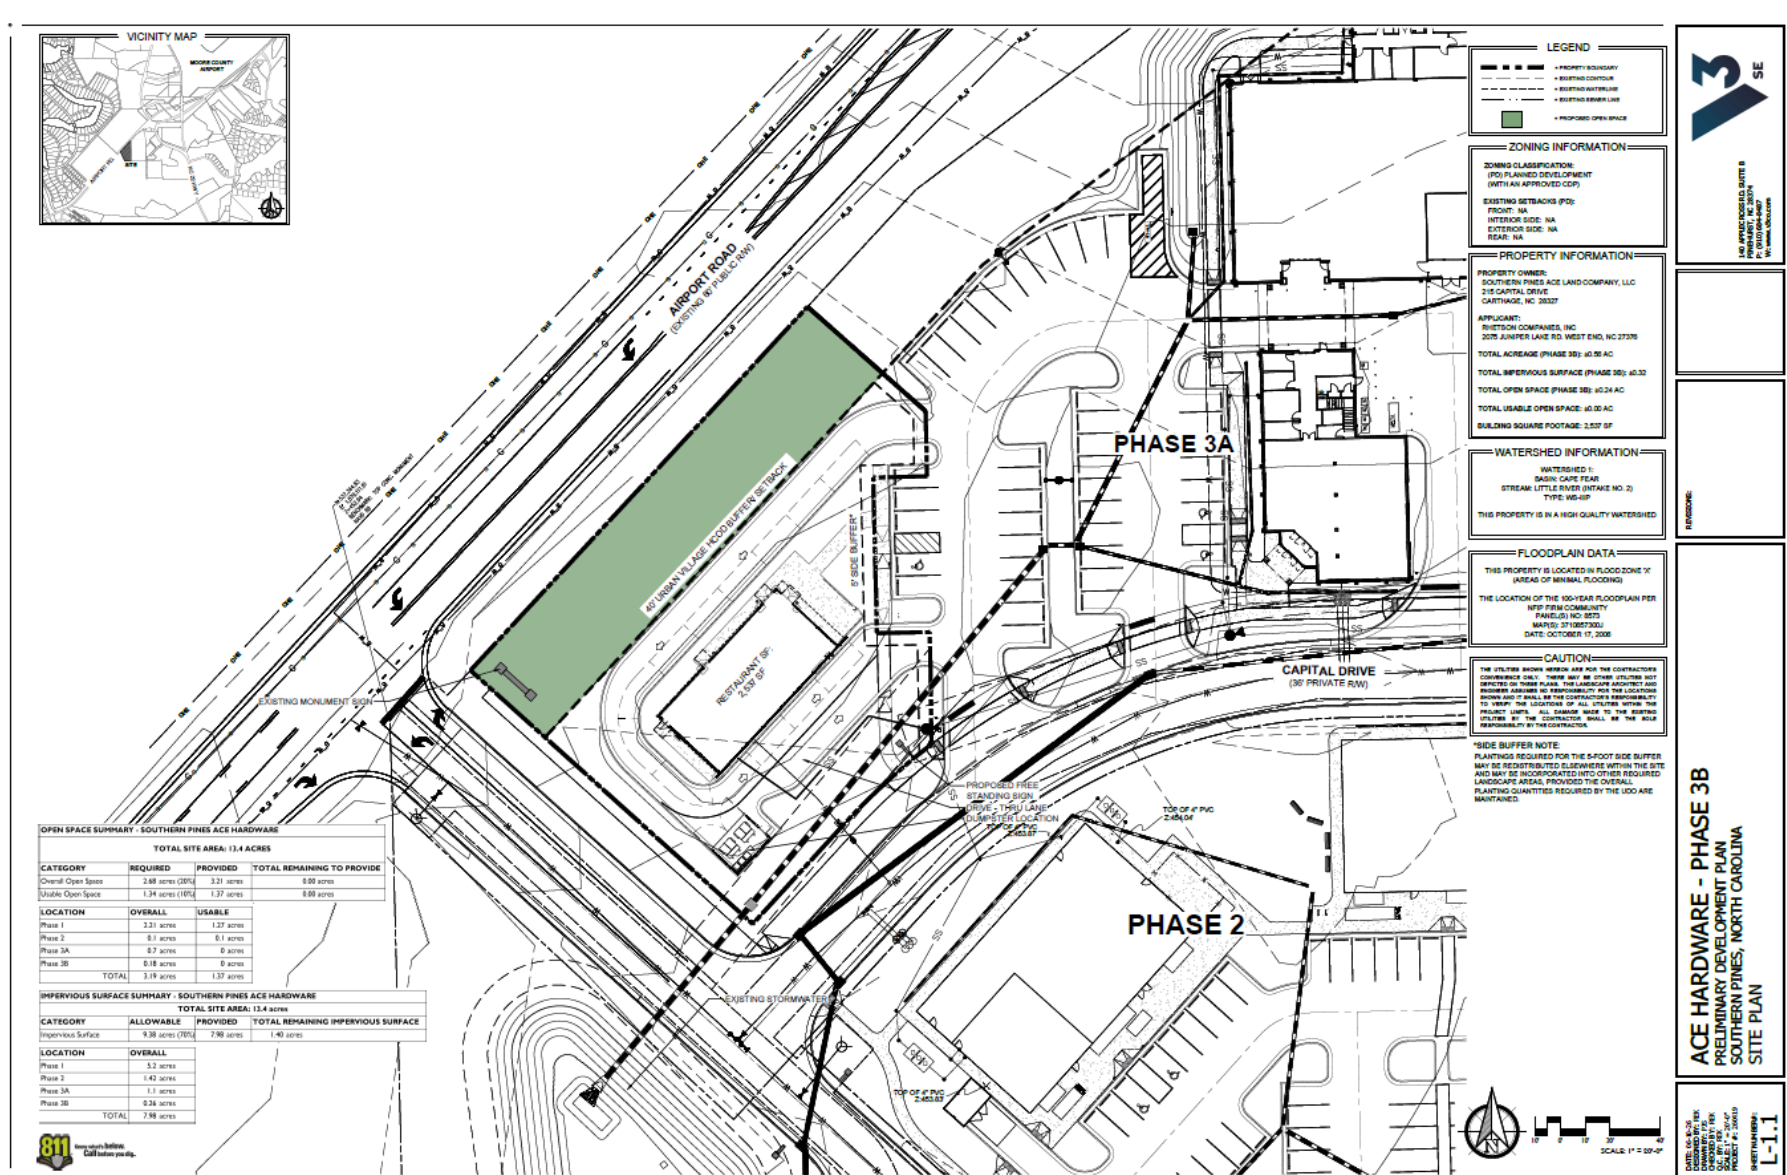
Proposed Plan Layout of Phase 3B (Full PDP Plan Attached to this Report)
